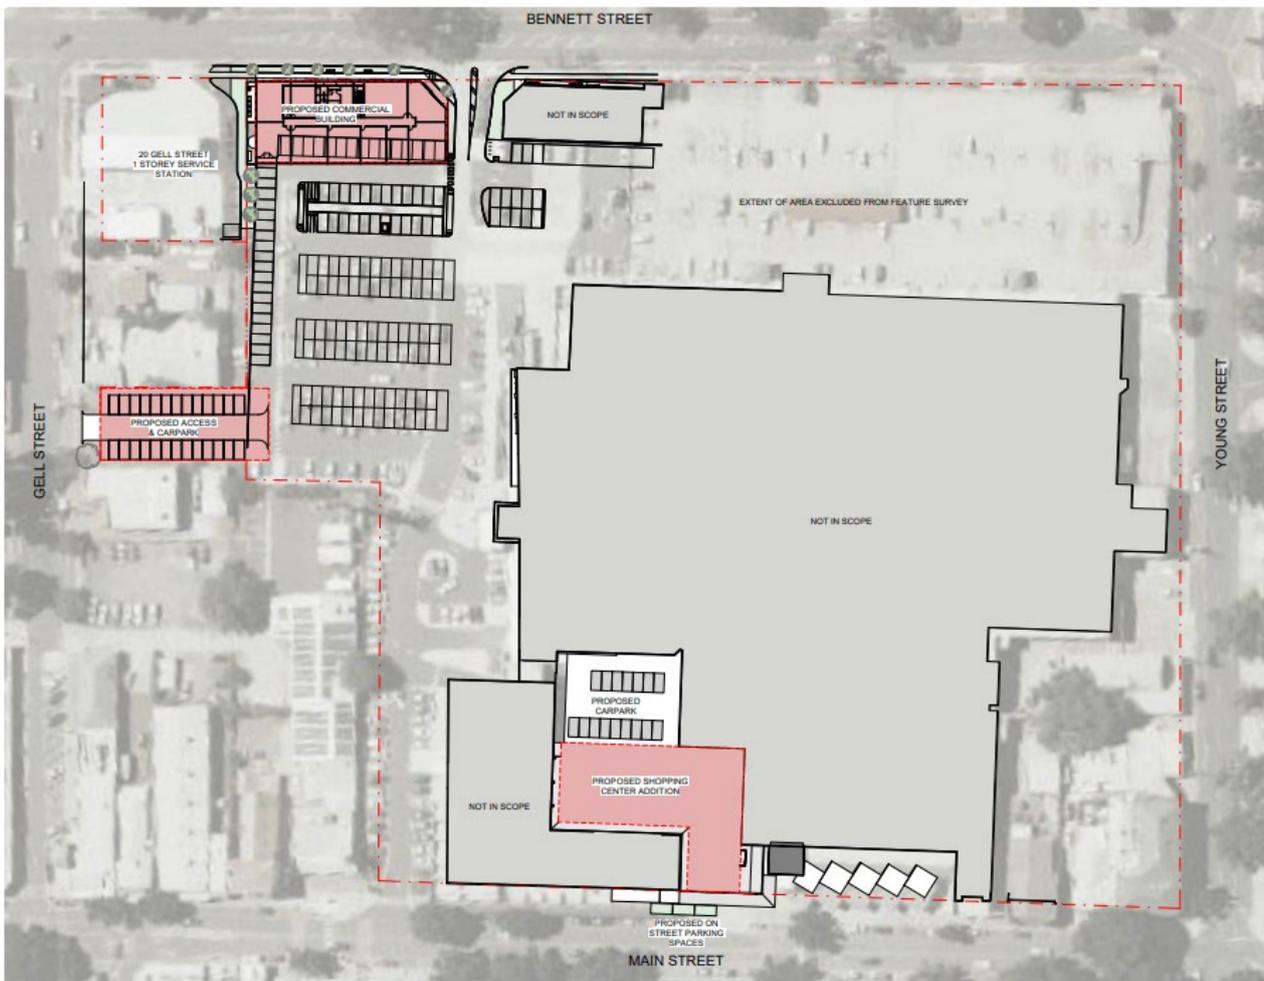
Proposed site plan highlighting the three areas of proposed development.
